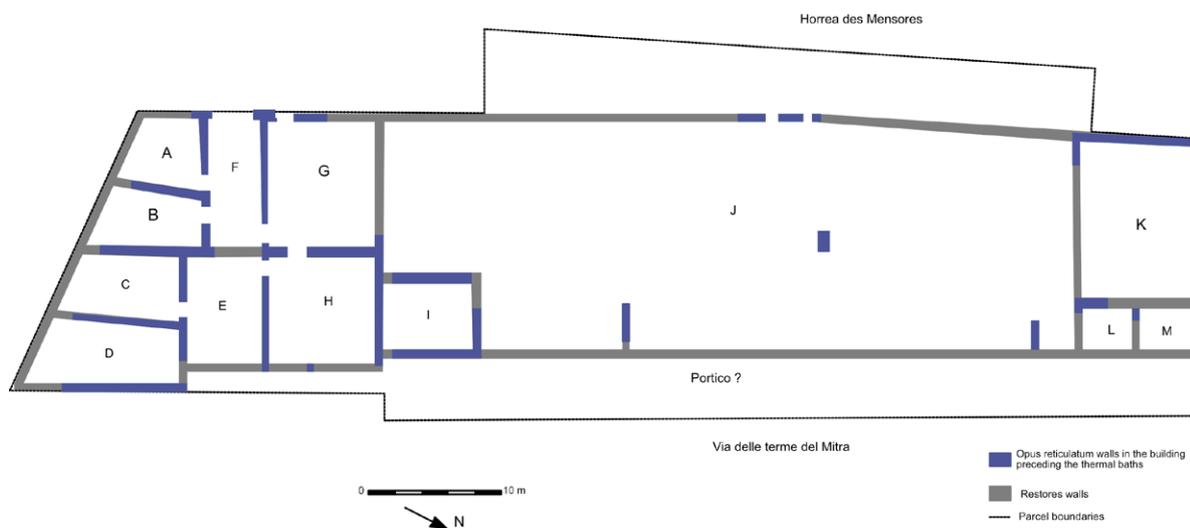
Reconstruction of the plan of the private building on the Mithras Baths block, *Lugdunum* (J. Boucard).
